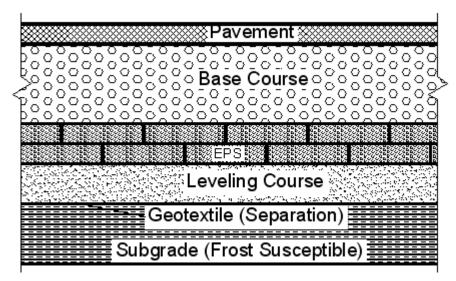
Pavement Insulation Utilizing EPS Geofoam
